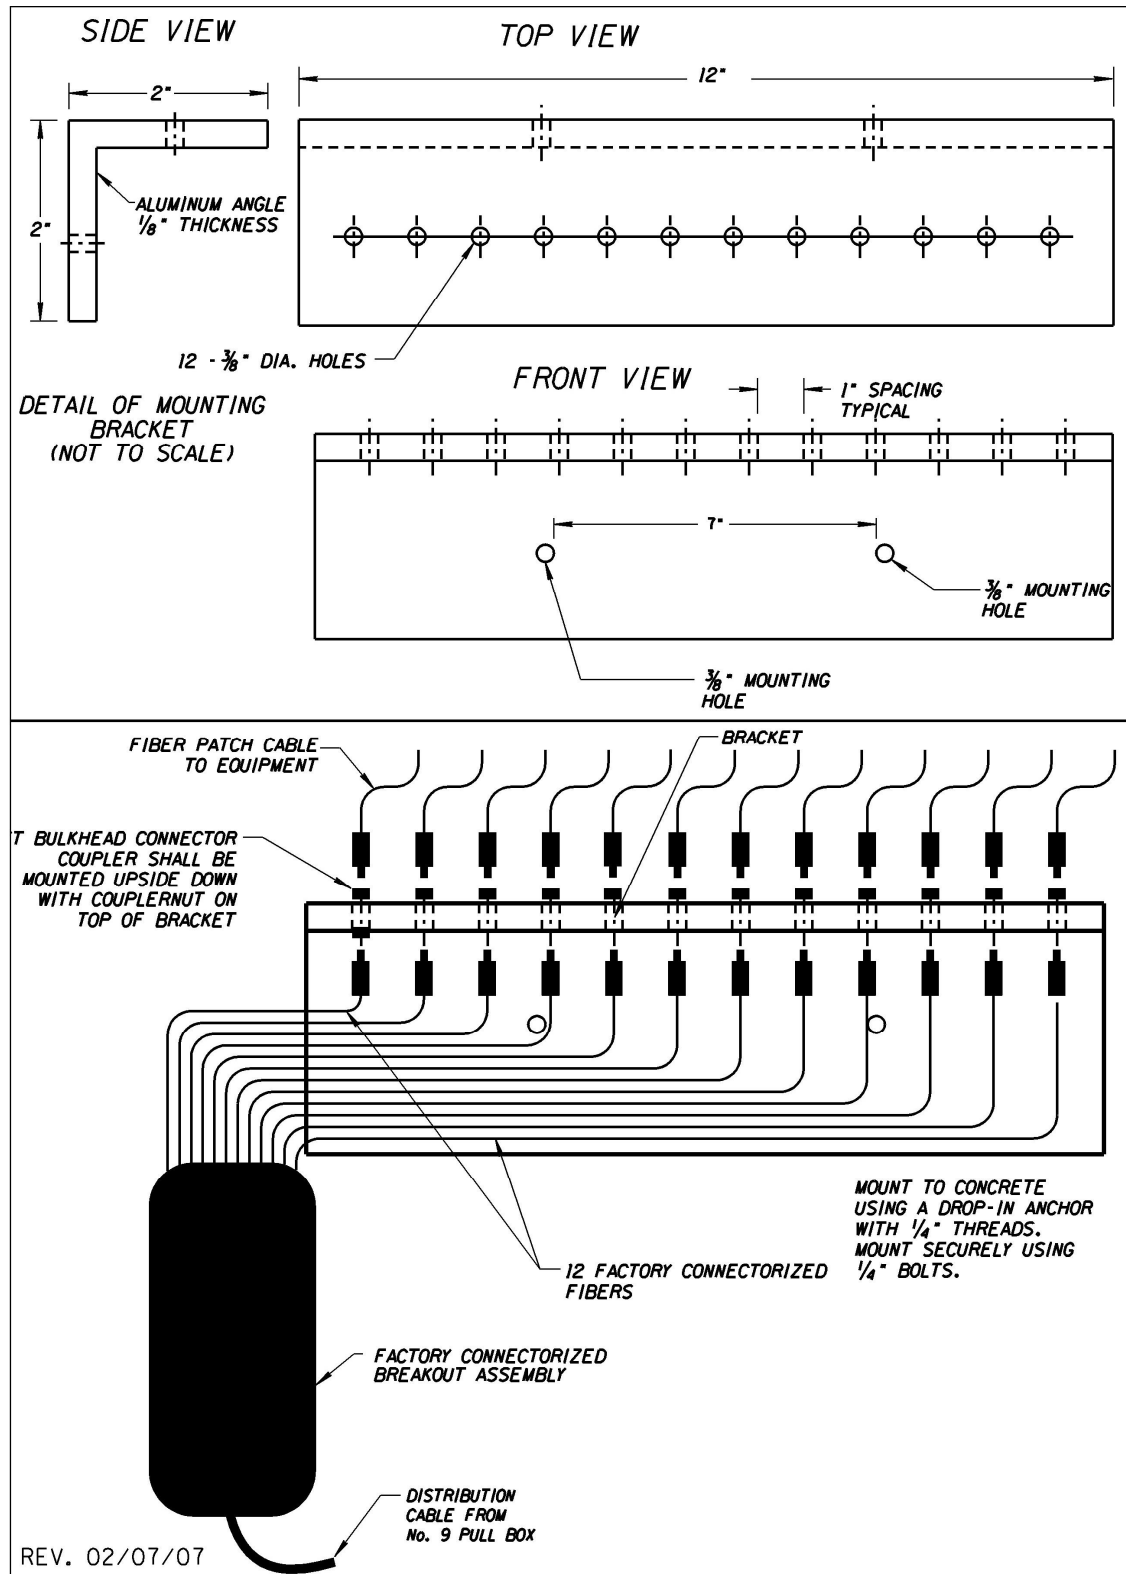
Cabinet Fan Out Kit and Fiber Patch Mounting Bracket Detail
